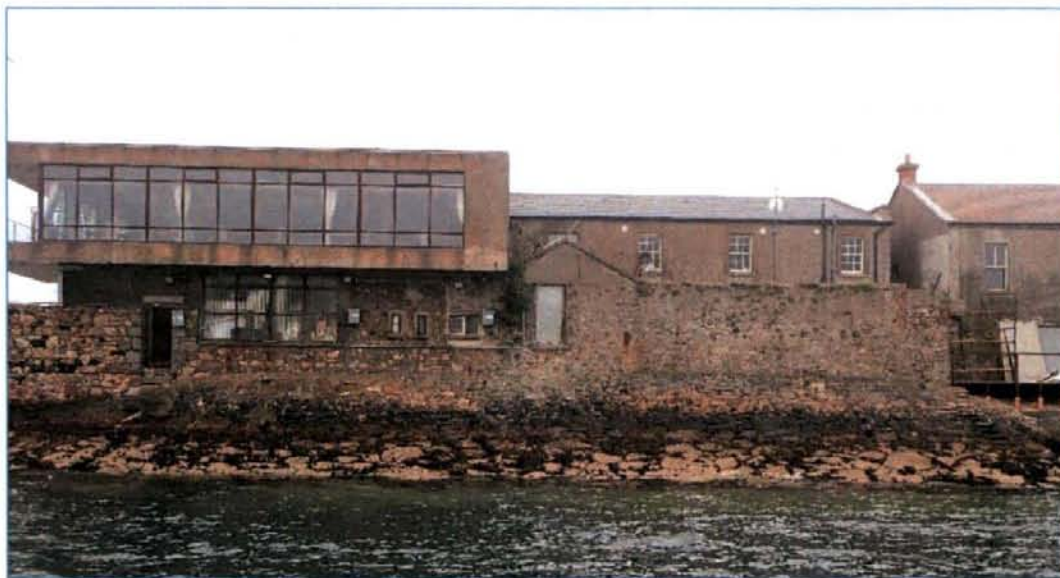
Sea view looking at rear of Clubhouse and details embedded in retaining wall.
